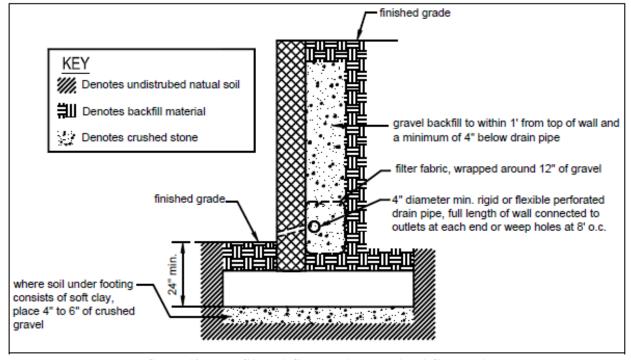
TYPICAL BACKFILL AND DRAINAGE DETAIL
